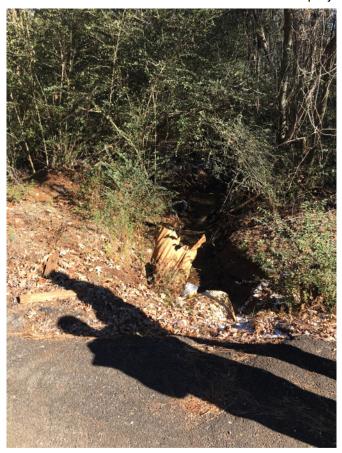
Damaged Culvert on the north side of Bierhalter Rd.
